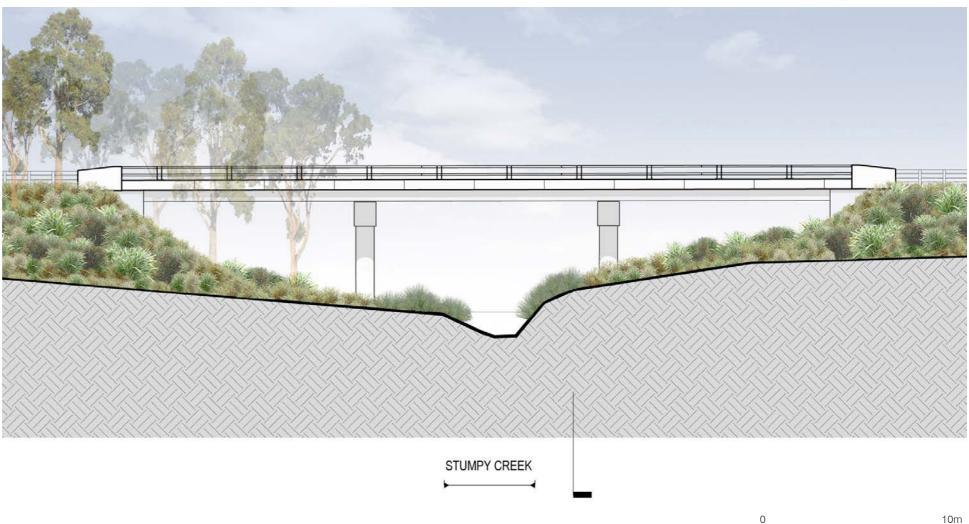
Northbound bridge over Stumpy Creek: Elevation
